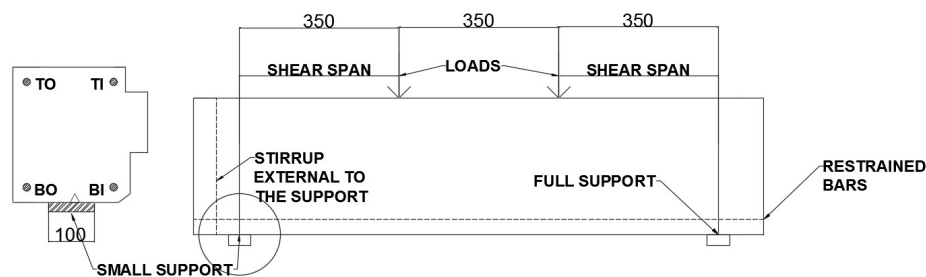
Directly supported 4-point bending test setup. Dimensions in mm.
